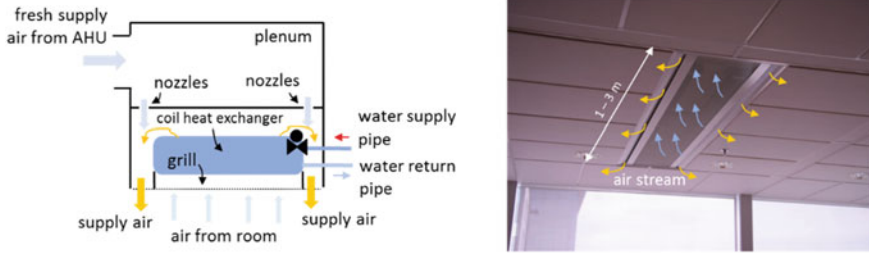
Schematic of active beam (left), active beam installed in the ceiling of a conference room (right)
